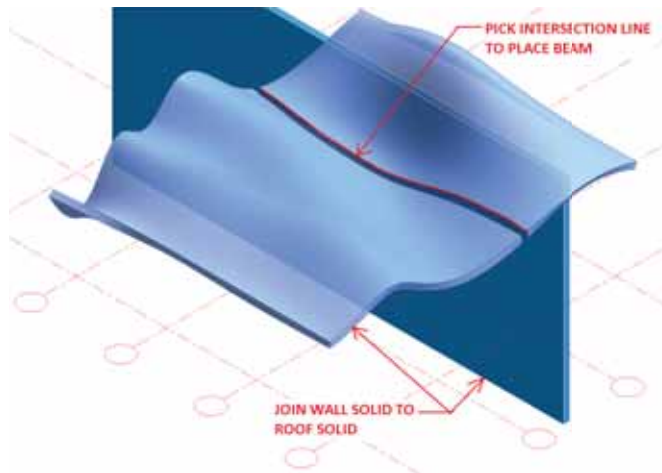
Joining Walls and Roof Solids, and Picking the Beam Location
